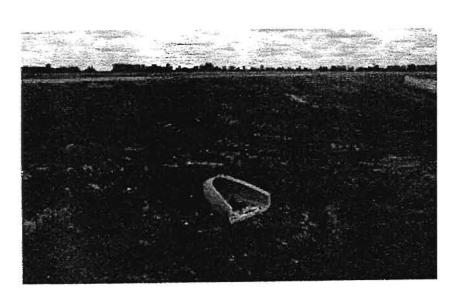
Installed 24-inch reinforced concrete pipe (RCP) under County State Aid Highway (CSAH) 13. RCP conveys water from the east to the west from outlet channel. Photo is of the west end of the RCP.
